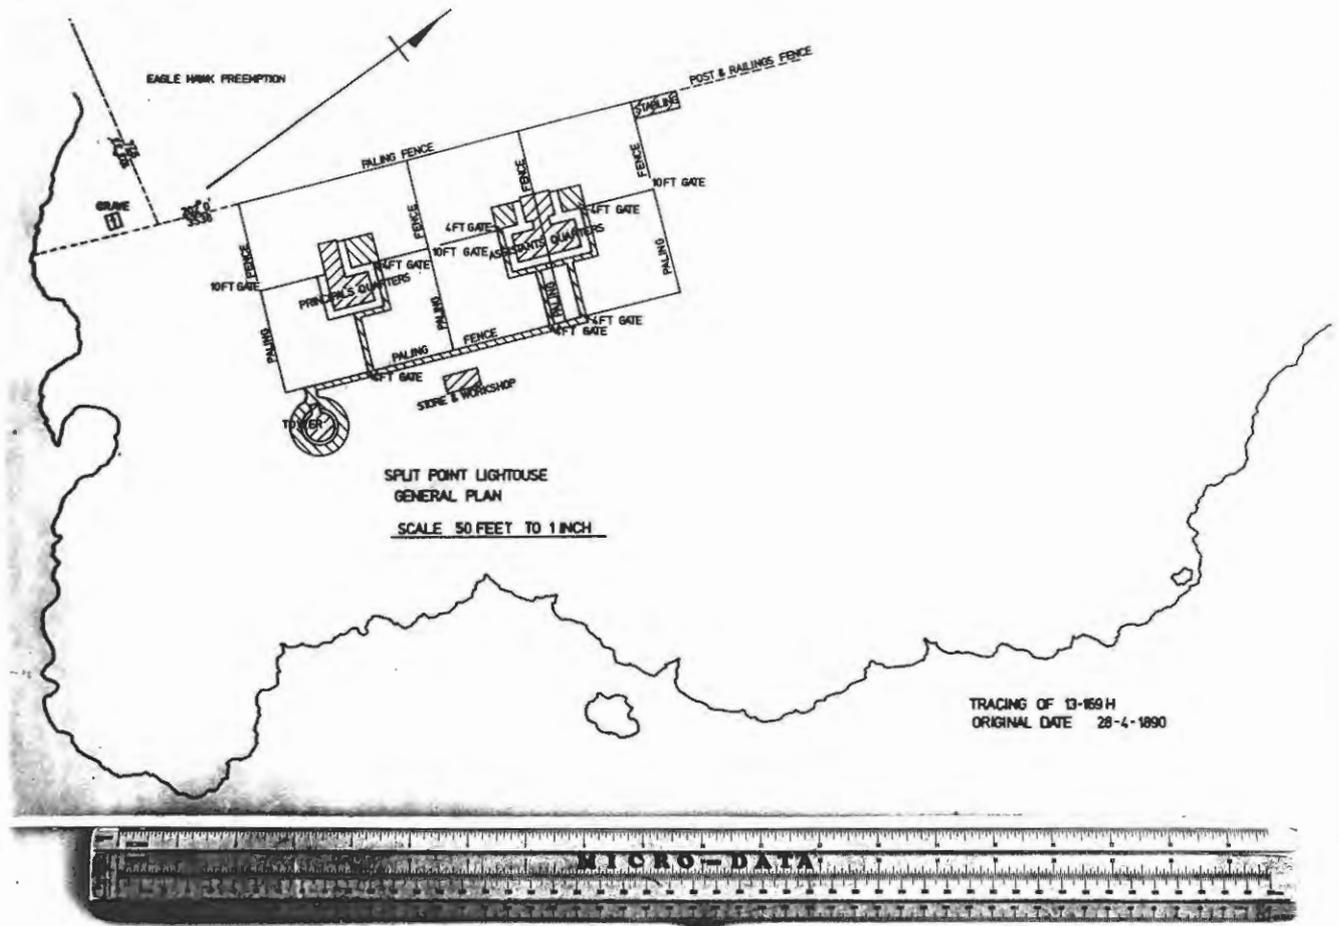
The lighthouse precinct, based on the original 1889 site plan
